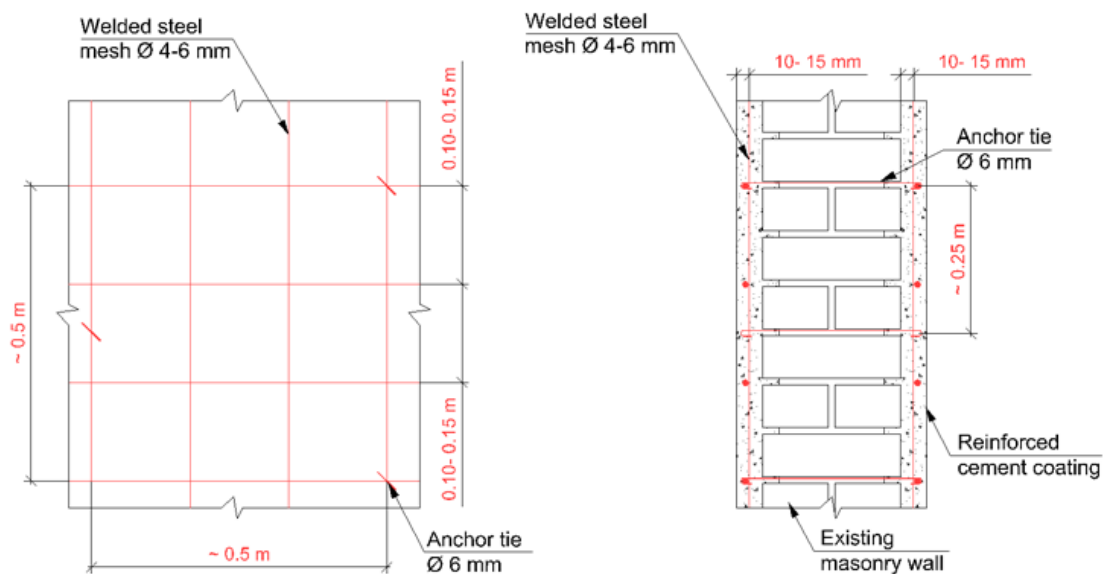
a Applying RC Coating to brick masonry wall [51]
